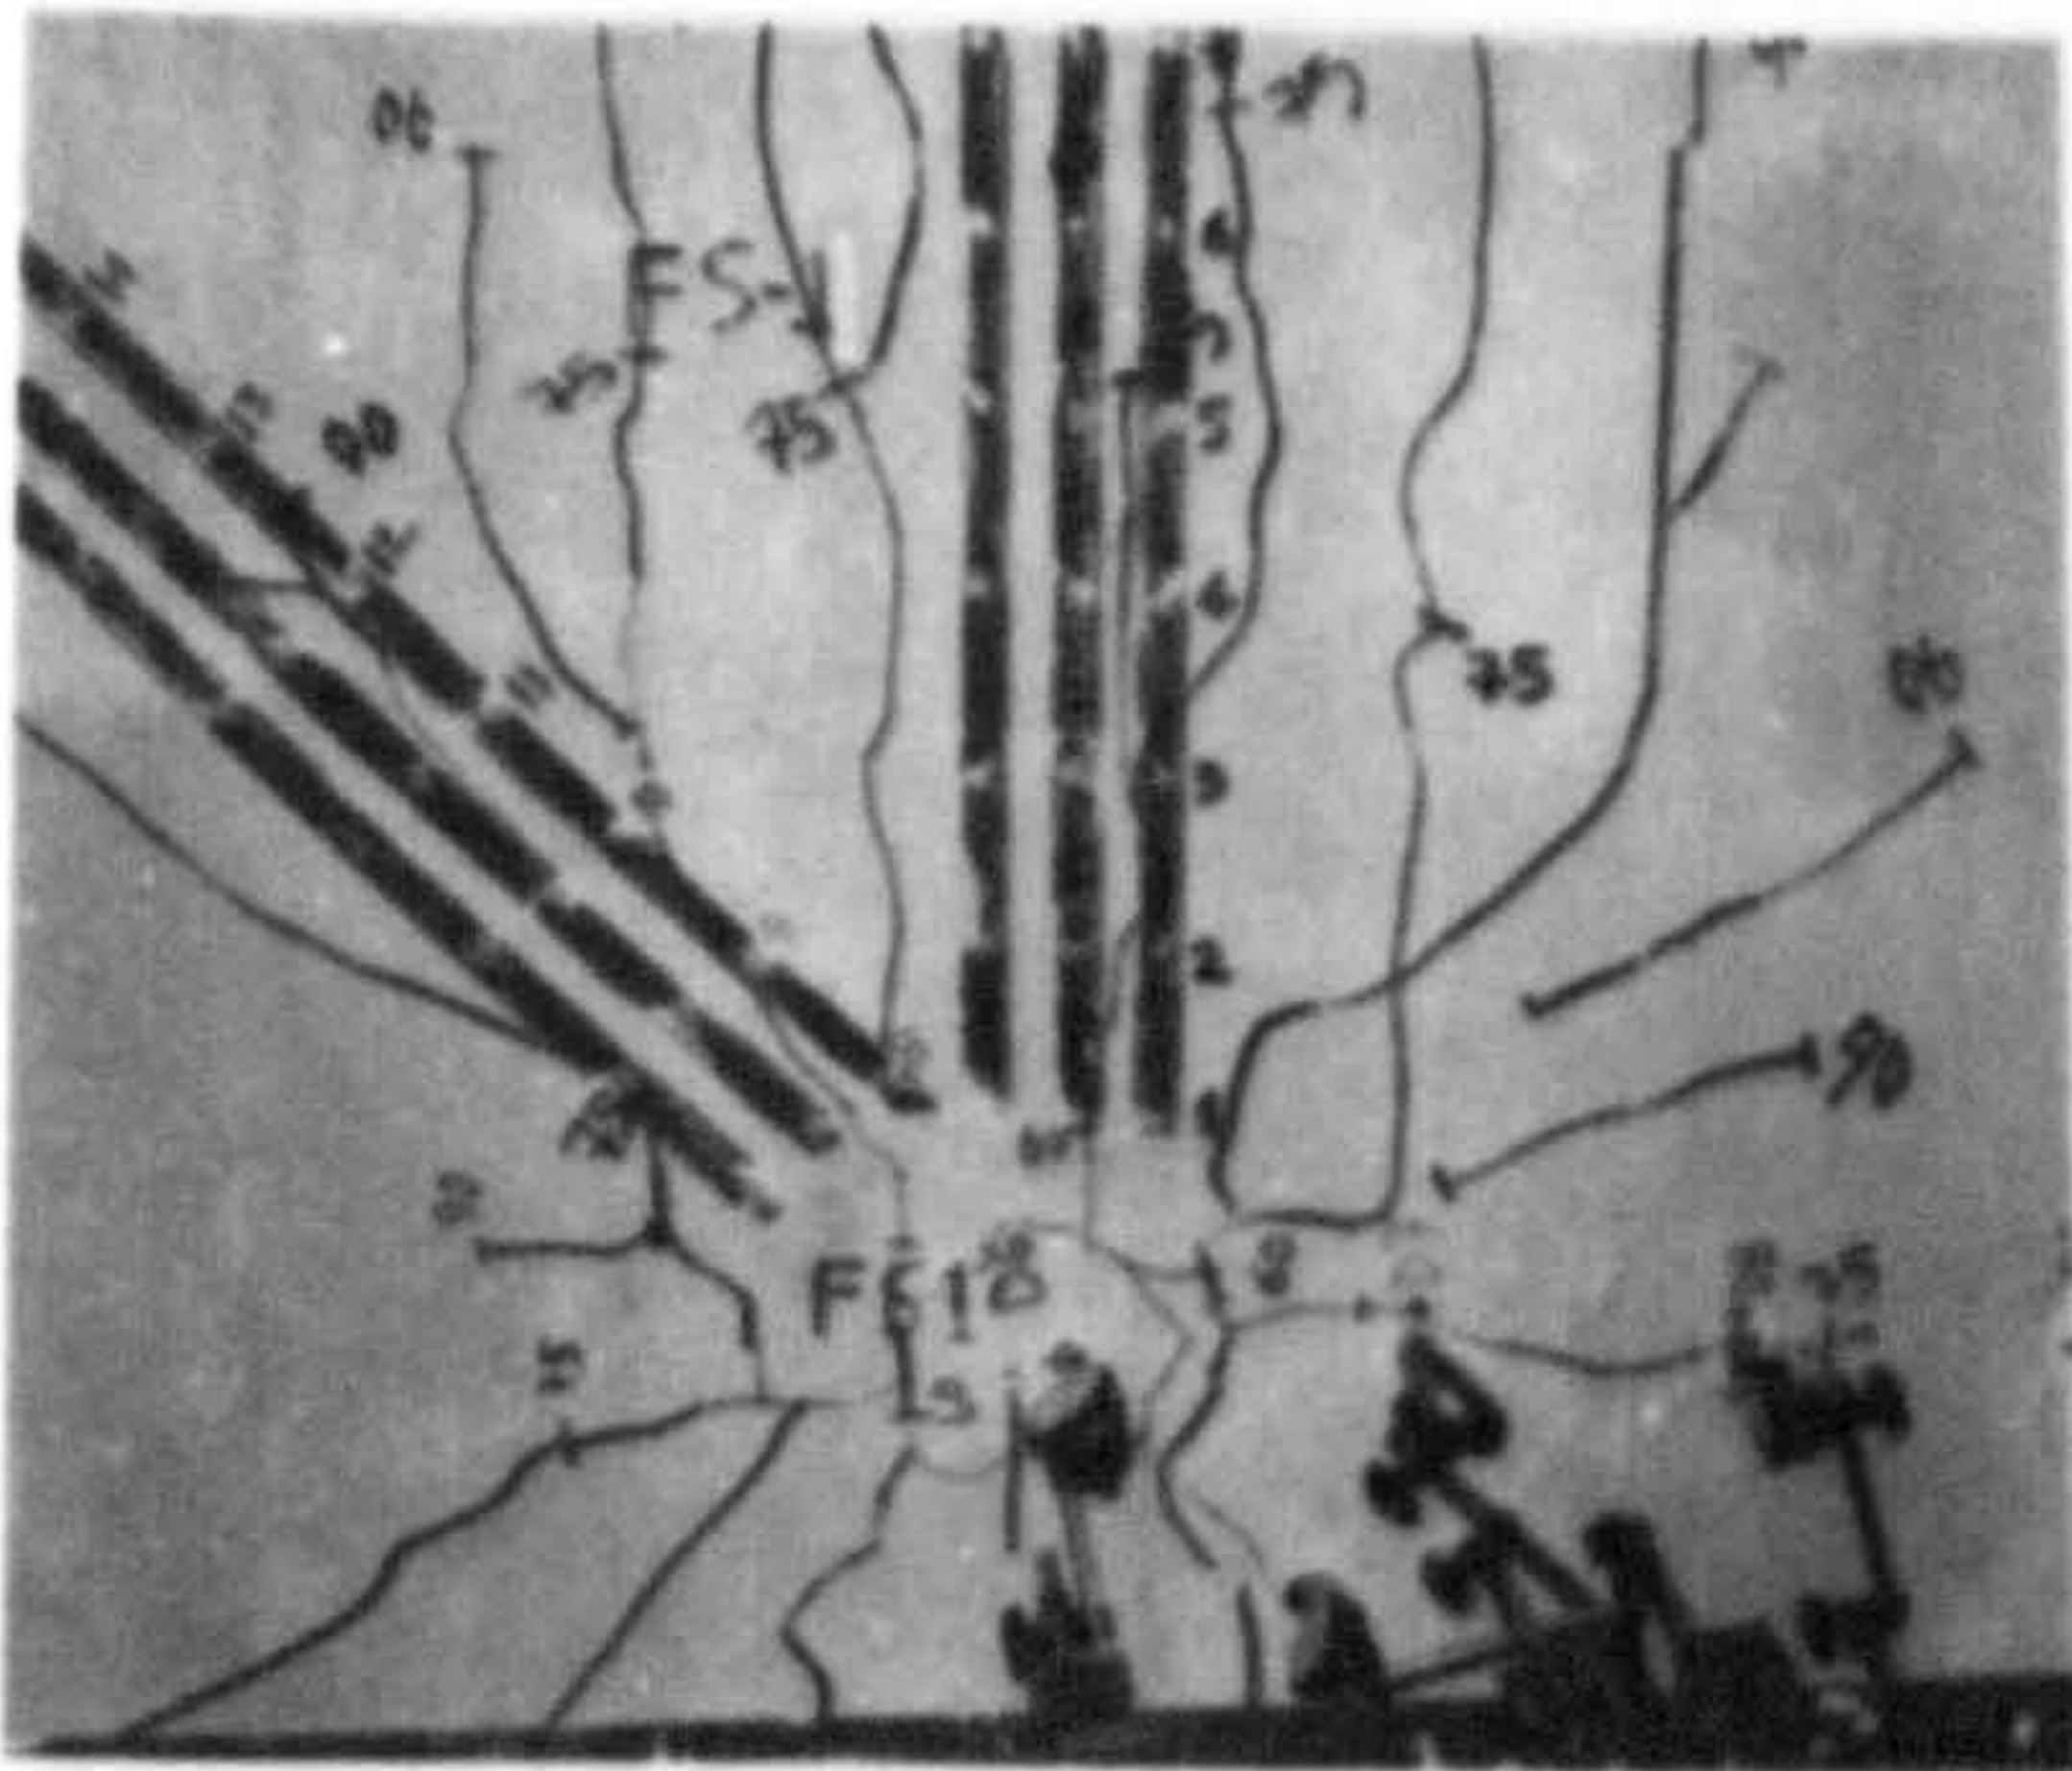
FIRST TENSION CRACK IN SLABS WITH AND WITHOUT FIBRE REINFORCEMENT
